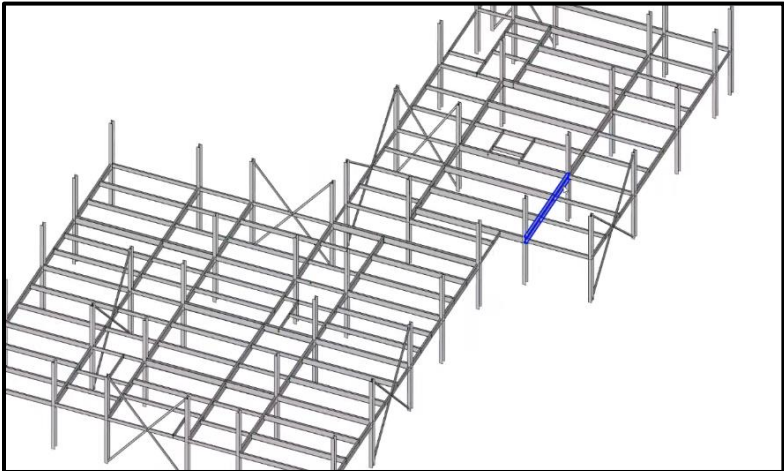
Structural framing member system of girders and beams on the 2nd floor of the veterinary hospital implementing only steel design for framing members
